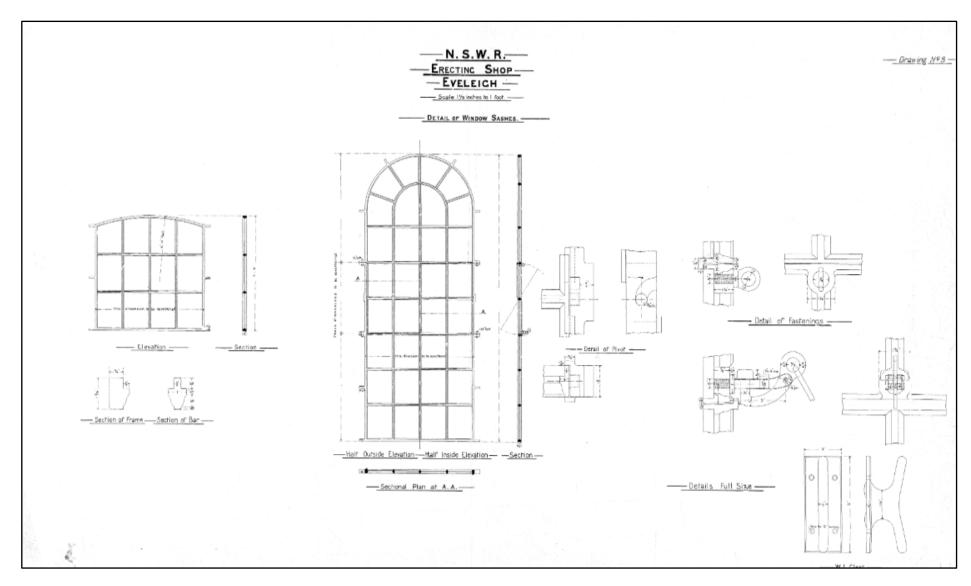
Detailed Drawings for the LES Building (formerly known as Erecting Shop), undated. Source: State Rail Authority, NSW State Archives, NRS-20550-2-24-COR/529P2, 38-4.
